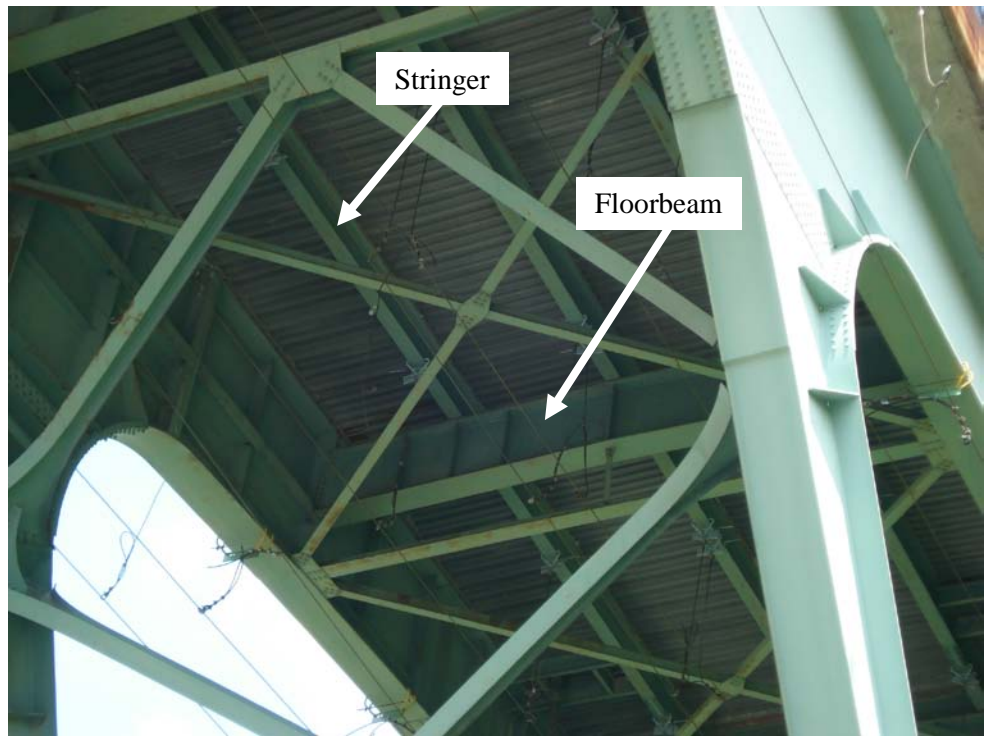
Two Frame Bridge with Floorbeam-Stringer Floor System
